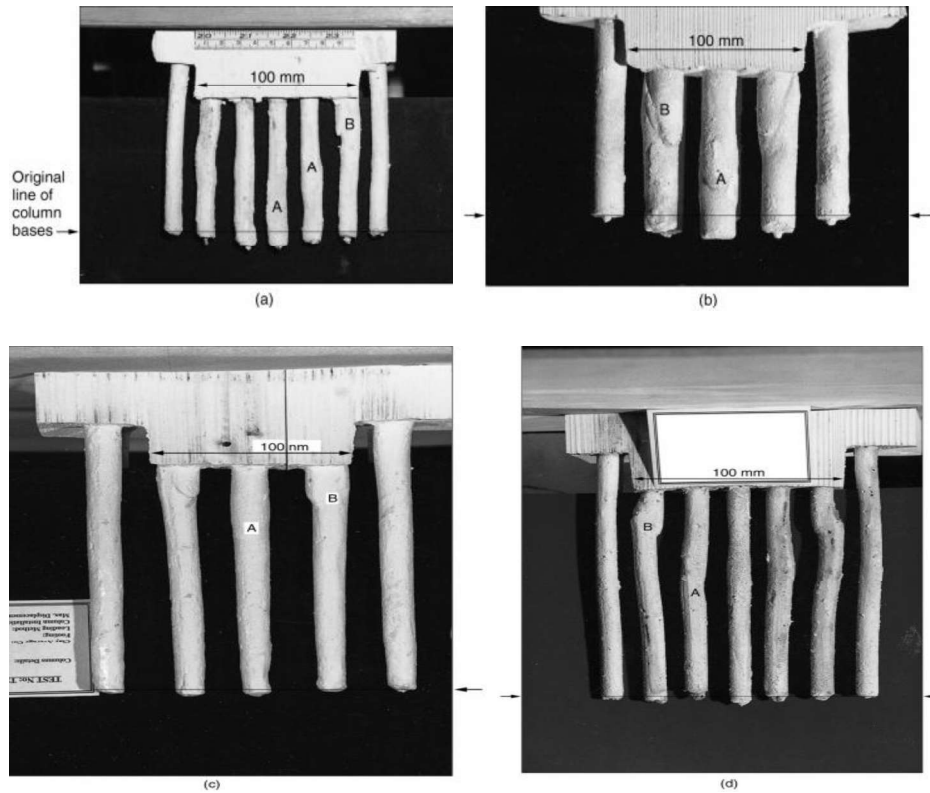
Deformed sand columns exhumed at the end of footing penetration. (Wood et al. 2000)
